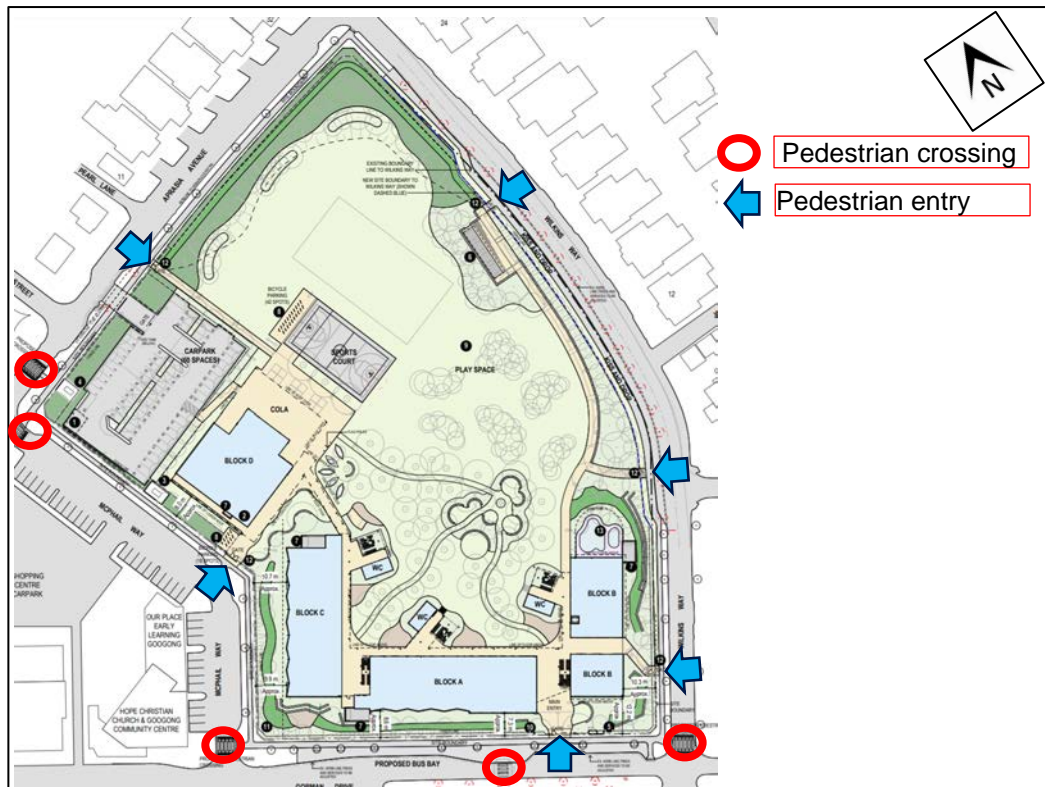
| Revised pedestrian layout (Source: Applicant's RtS 2021)
